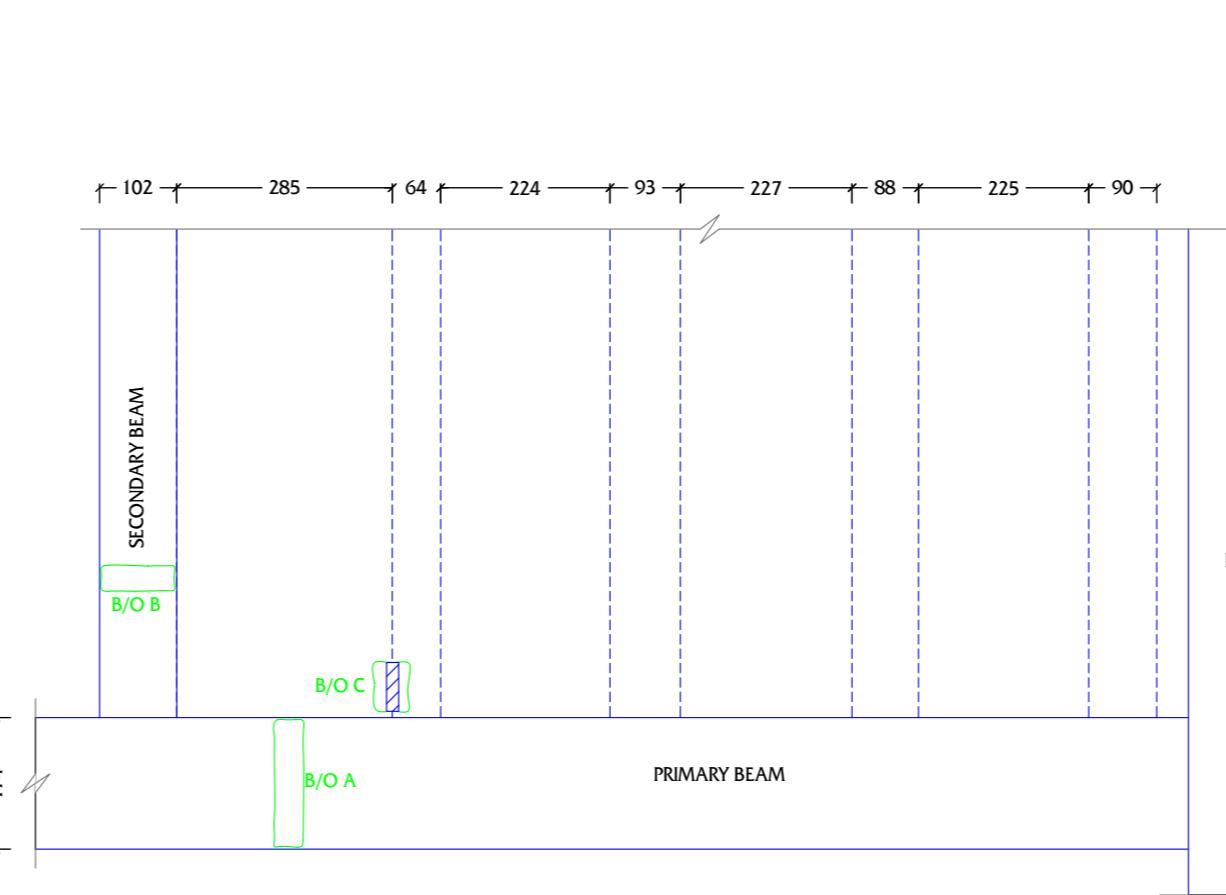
PART REFLECTED 1ST FLOOR SLAB SOFFIT PLAN SHOWING DETAILS OF BEAM AND PRECAST CONCRETE PLANKS - SURVEY AREA H/1-3 SCALE 1:10
